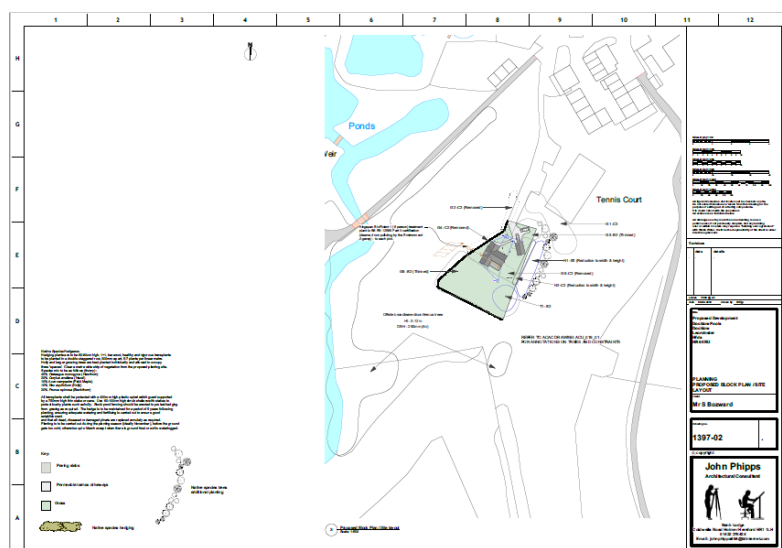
Proposed Block Plan/Site Layout shown 'indirectly'
